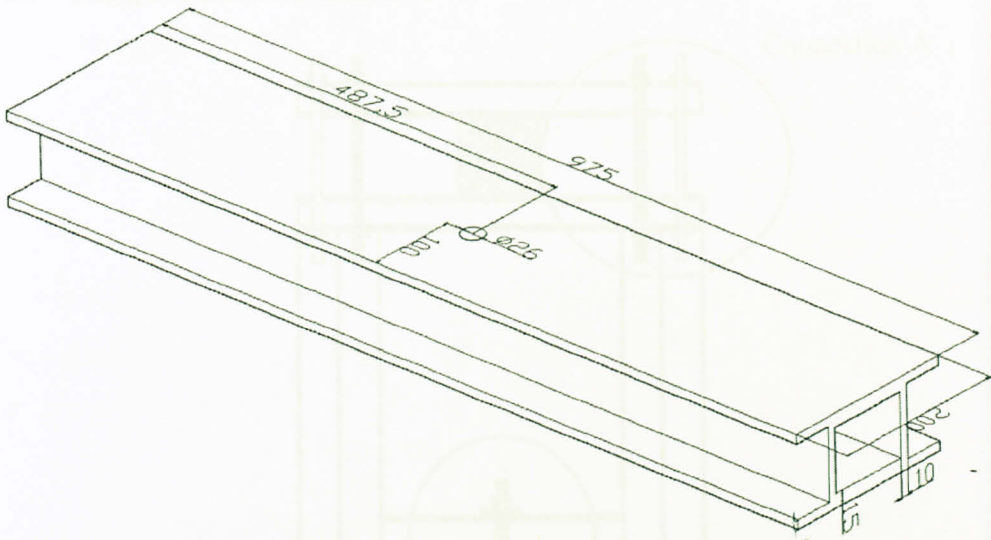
Isometric view of the 975mm x 200mm x 100mm plate girder
